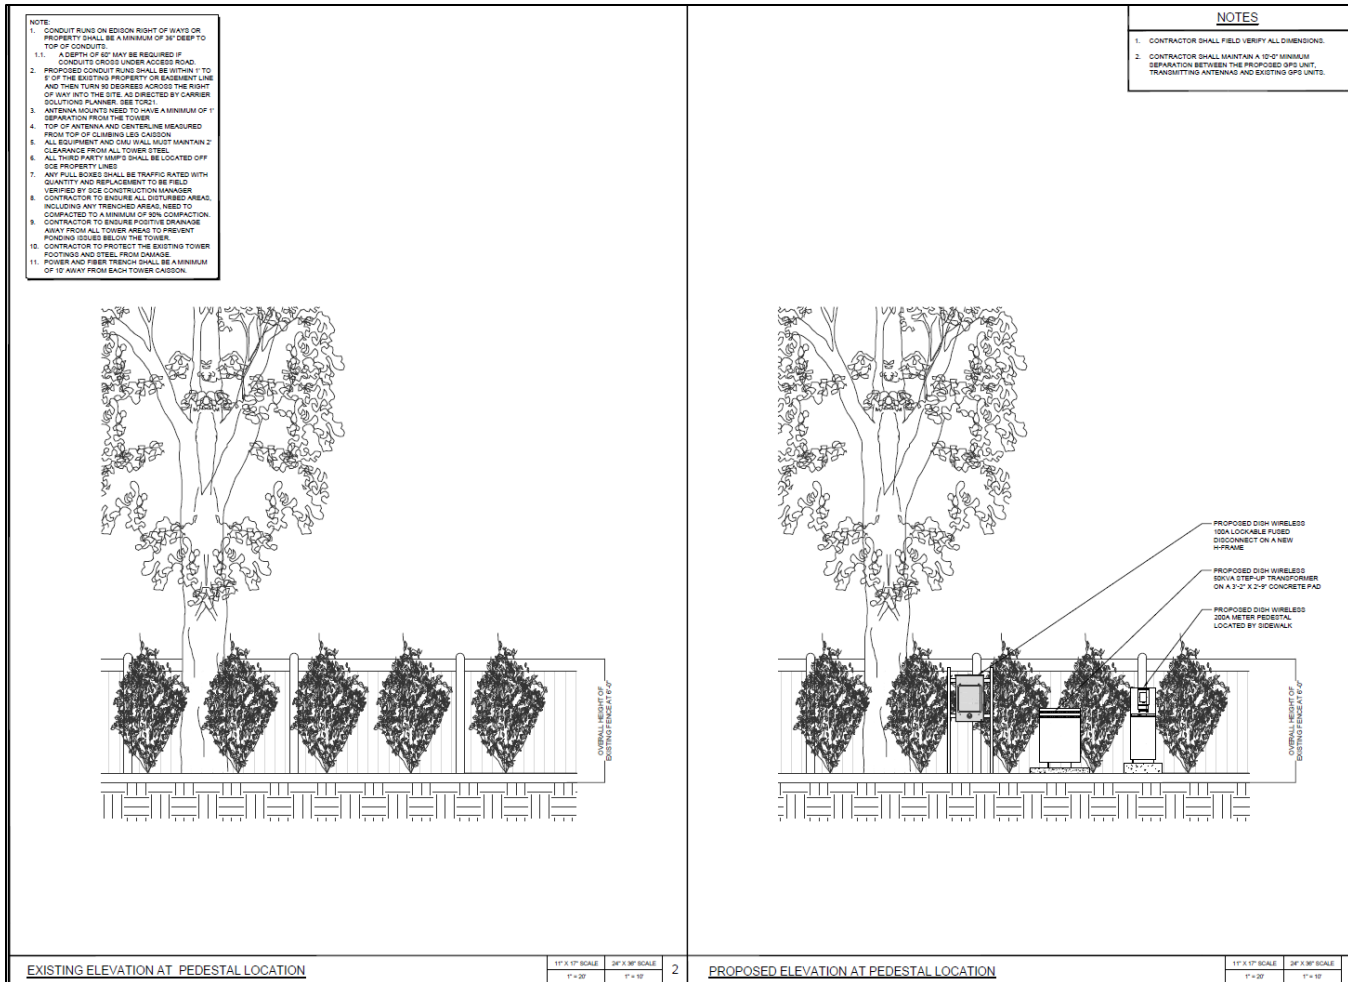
Exhibit D: PROPOSED ELEVATIONS CONTINUED
